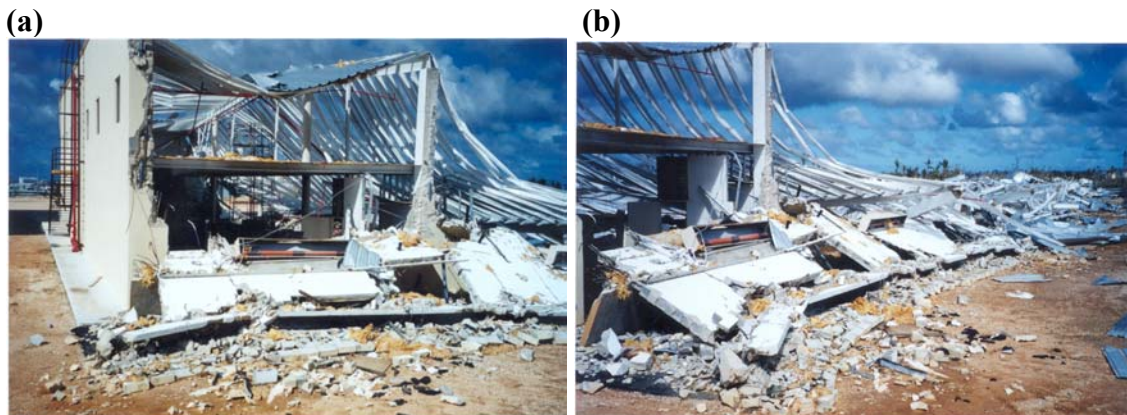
(a) Nearly completed warehouse in Macheche, Dededo with reinforced concrete wall still standing. (b) Same building from another angle showing total destruction of the side walls and roof structure. (NOAA Photos)
